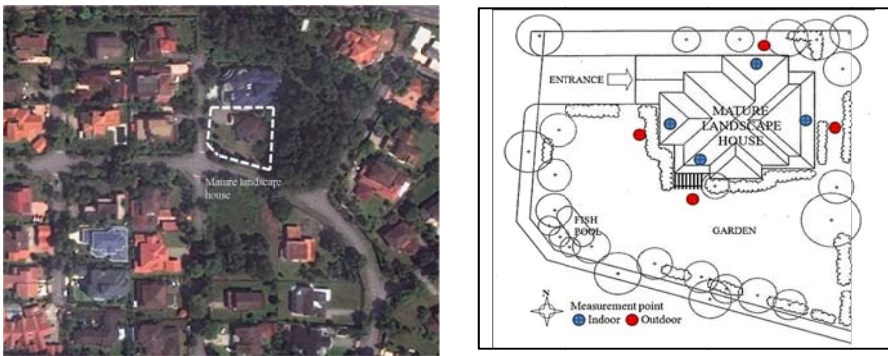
Location plan (left) and landscape plan (right) of the mature landscape house
